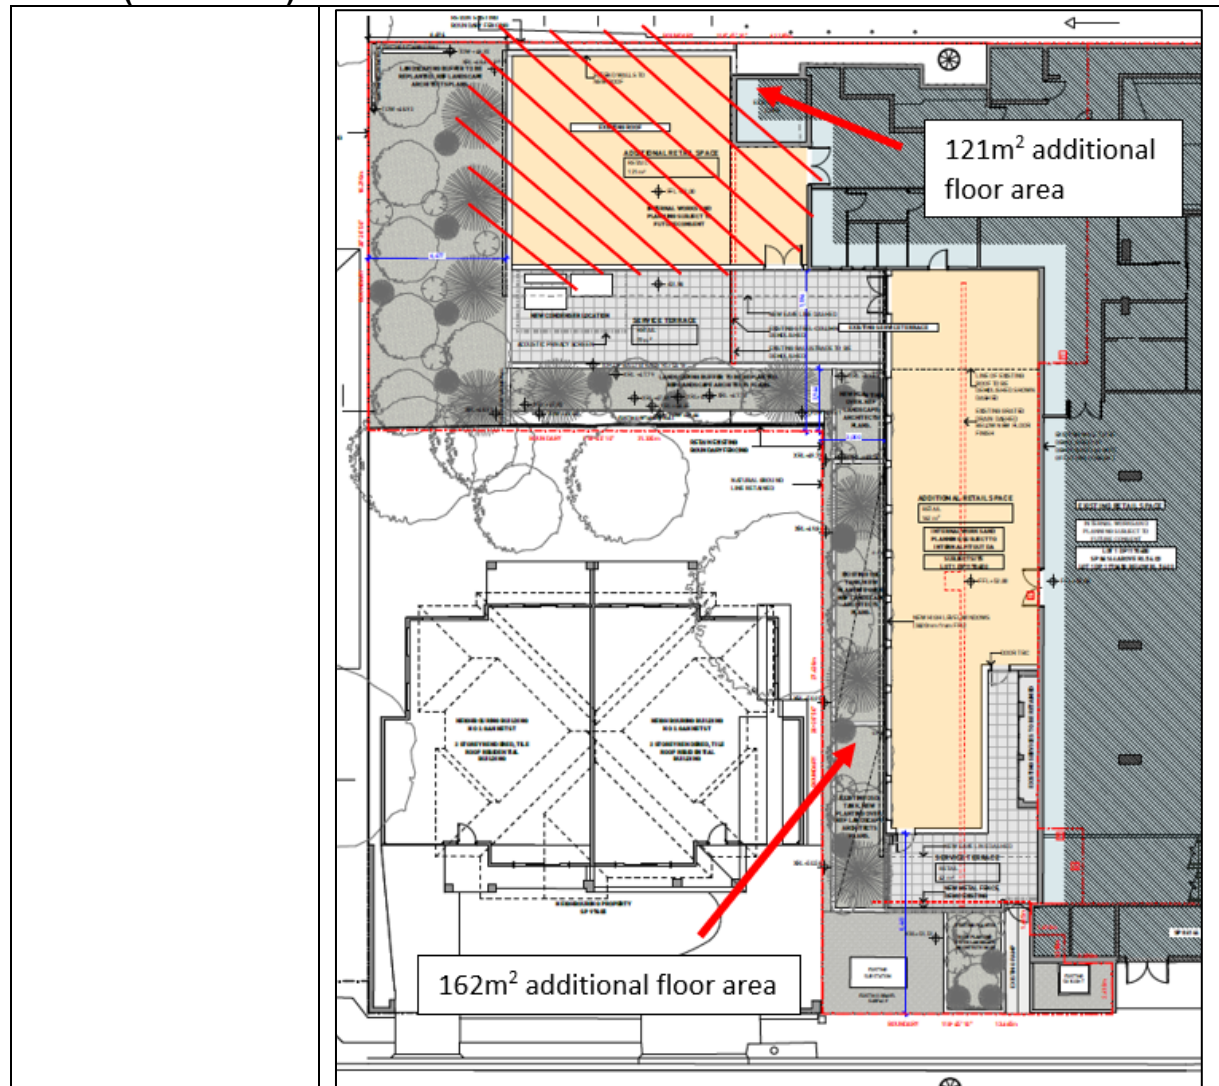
Floor plan of original proposal (enclosed area with hatching has been deleted with the amended proposal and the enclosed area to the west has been reduced by 23m²)
